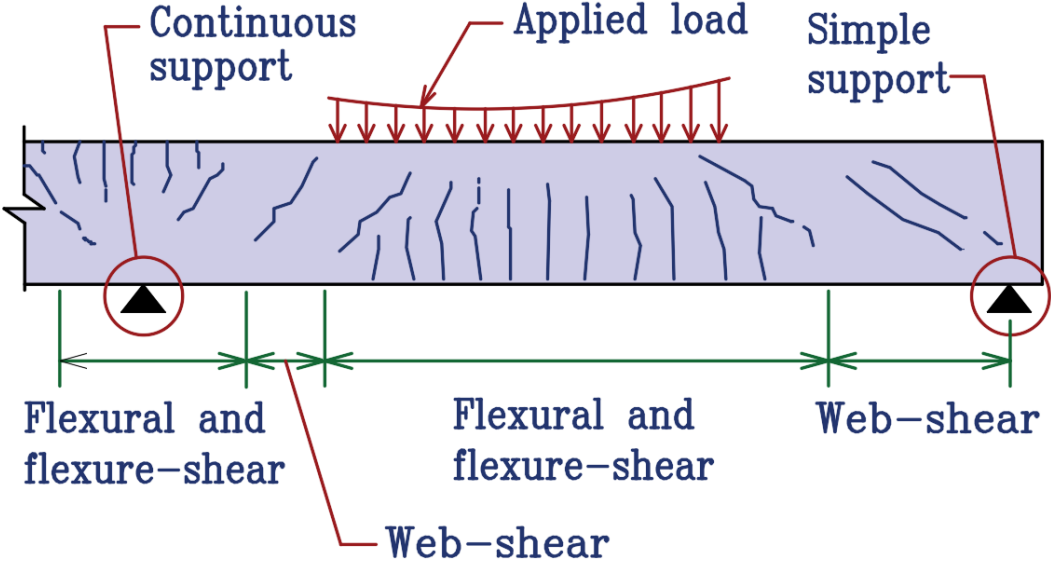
Concrete beams cracking (based on ACI 318-19)
